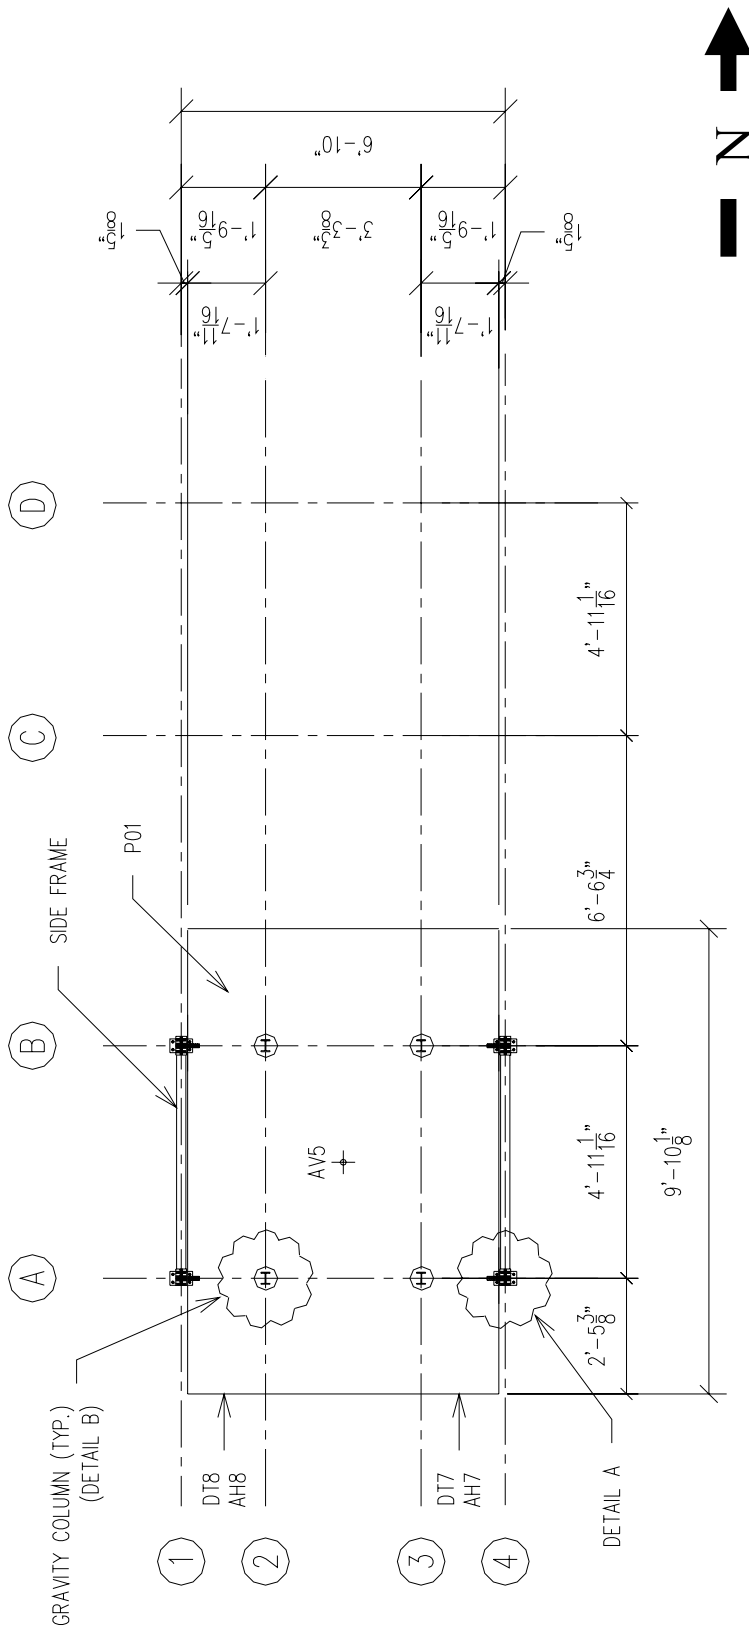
Instrument Locations for Identification Test: 3rd Floor
